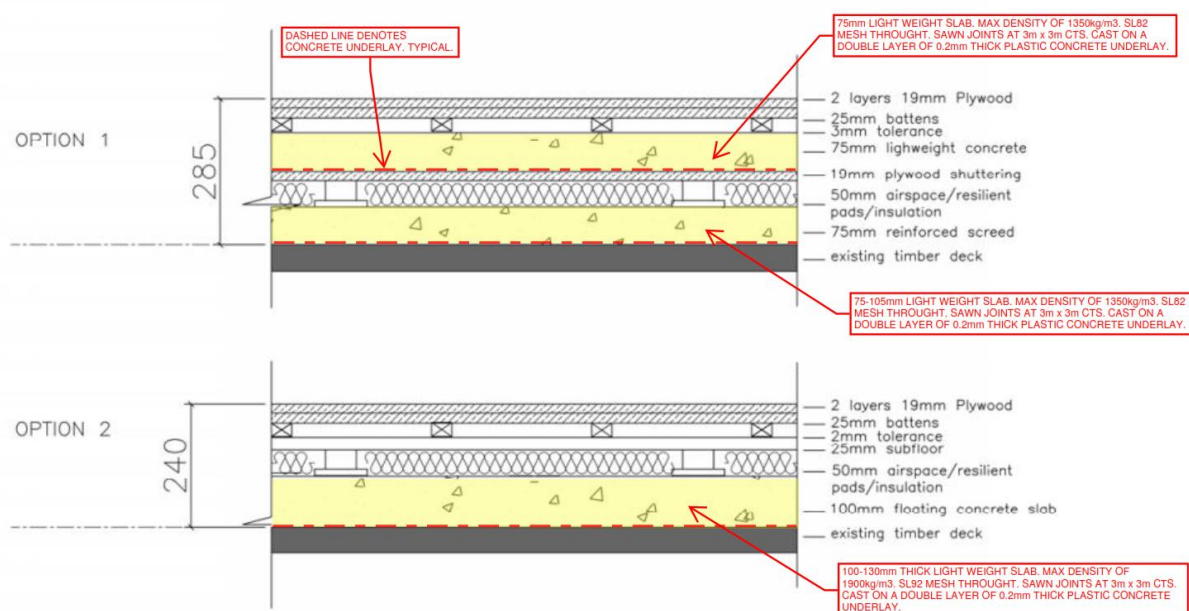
Typical detail of acoustic floor. Sketch provided by TTW showing the separation from the old structure and removable floor treatments.
